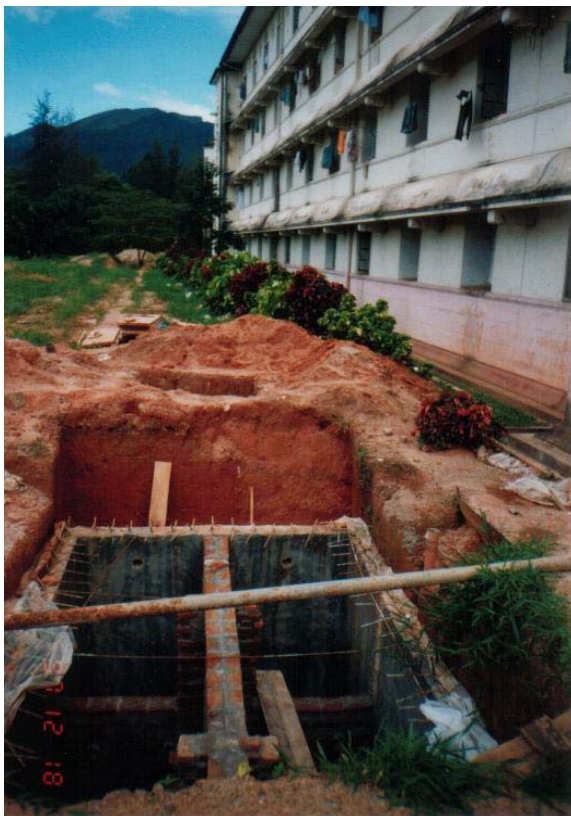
A septic tank under construction outside one of the dormitory wings.
